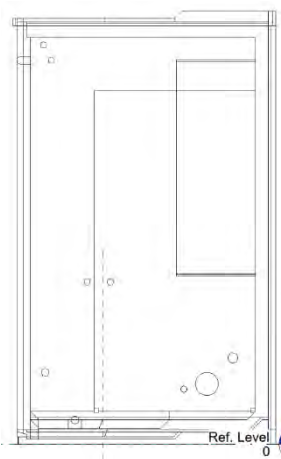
Elevation View of Volumetric Precast Concrete Unit
